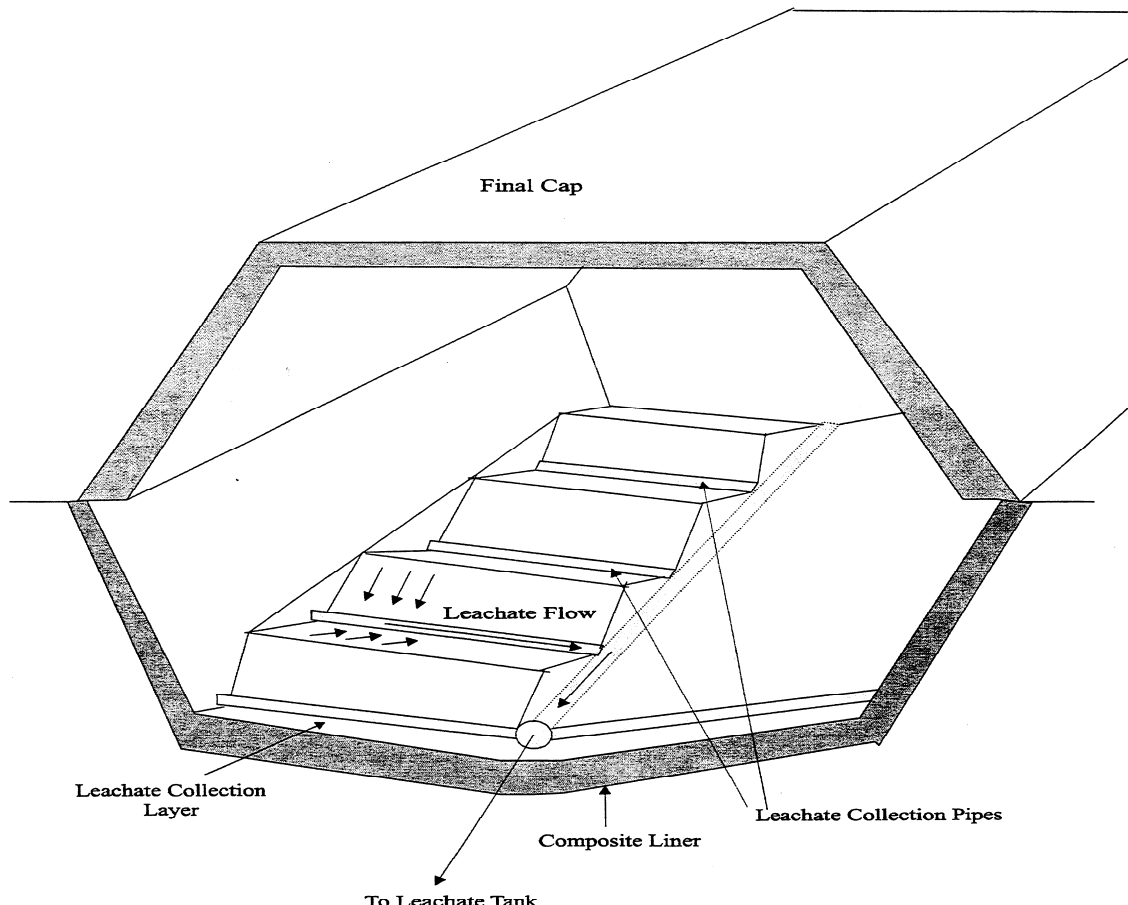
shows a cross section of a landfill with a leachate collection system installed.
